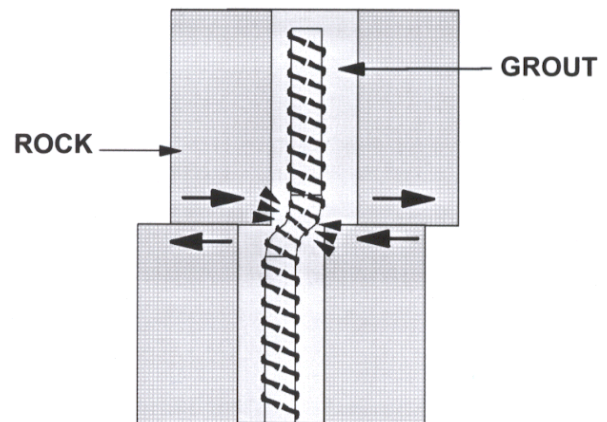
Tension and bending in a fully grouted bolt caused by slip on a bedding plane.
